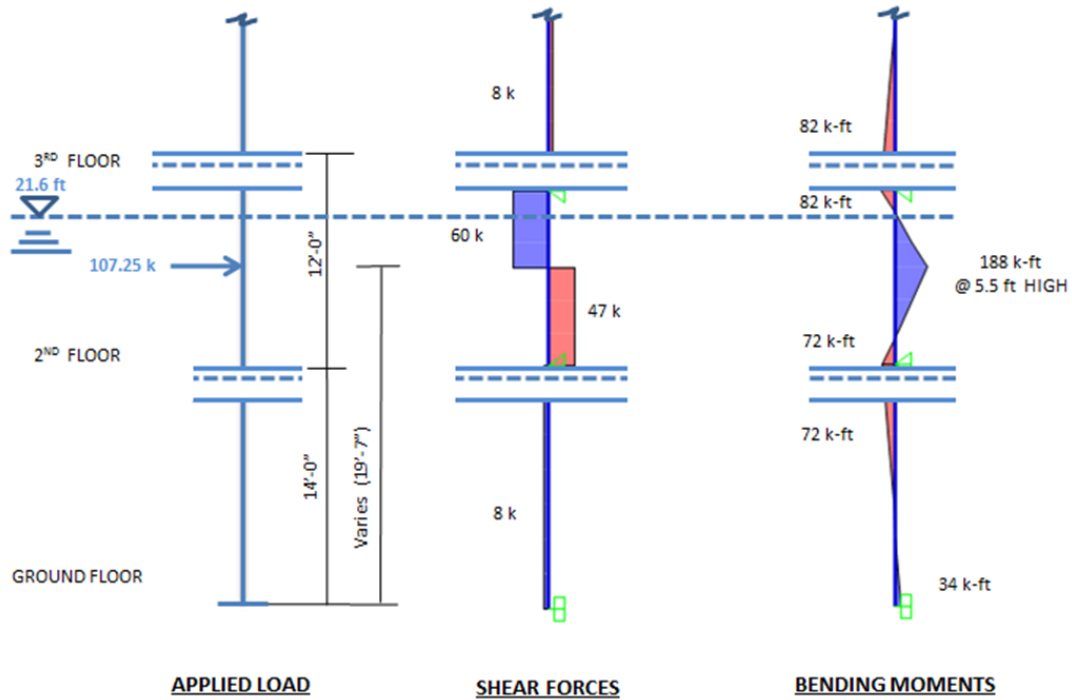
Impact load applied at " $d + h_c$ " away from the end of column on the 2nd floor
